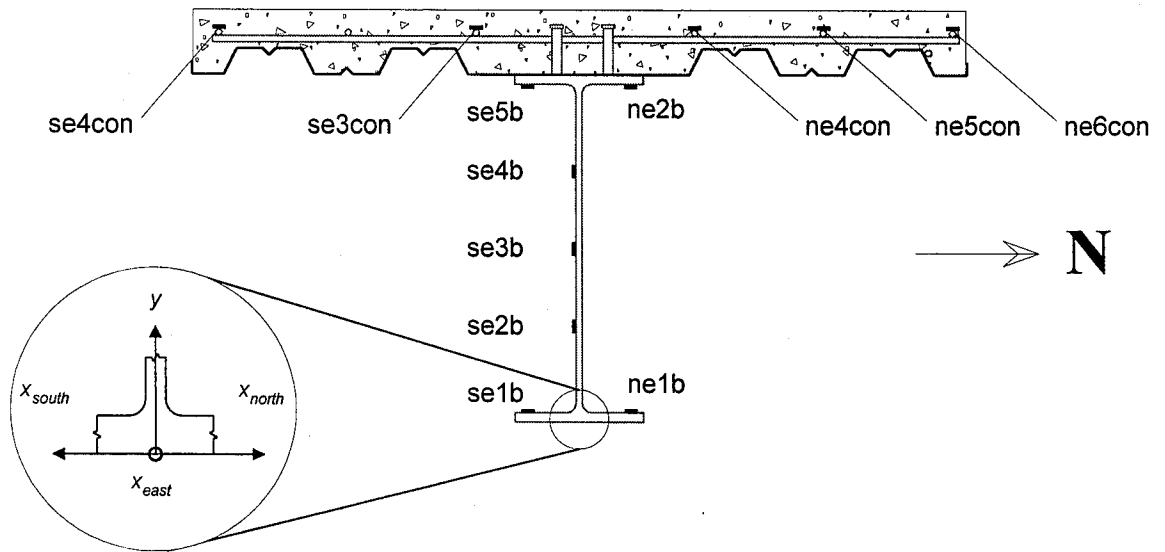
Section C-C: Strain Gages of East Girder Cross Section
